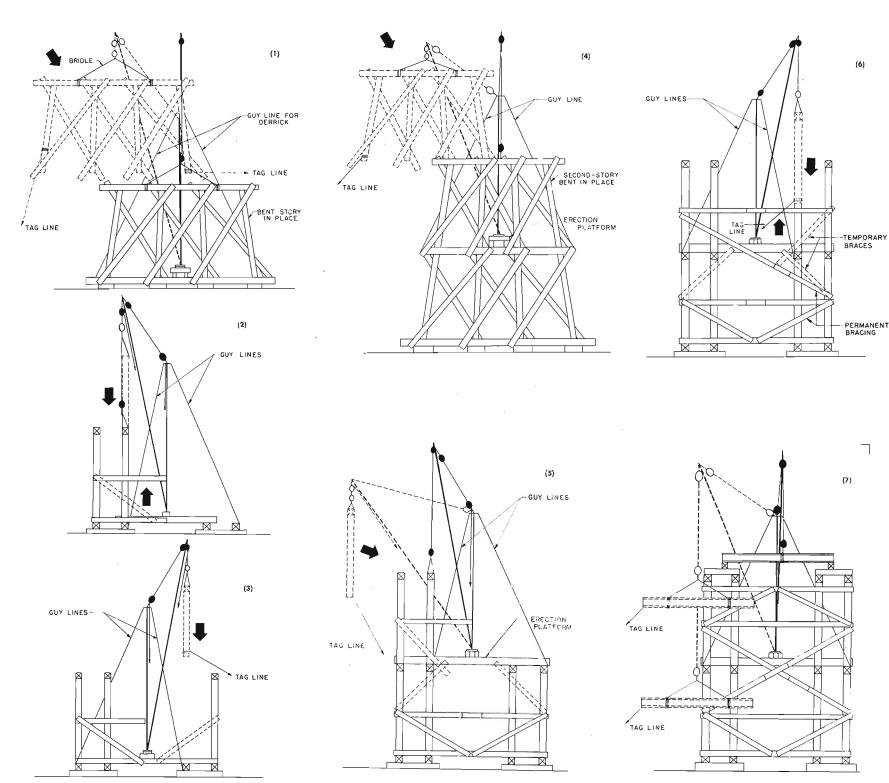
Sequence of erecting two-story timber tower with guy derrick made of bridge timbers
